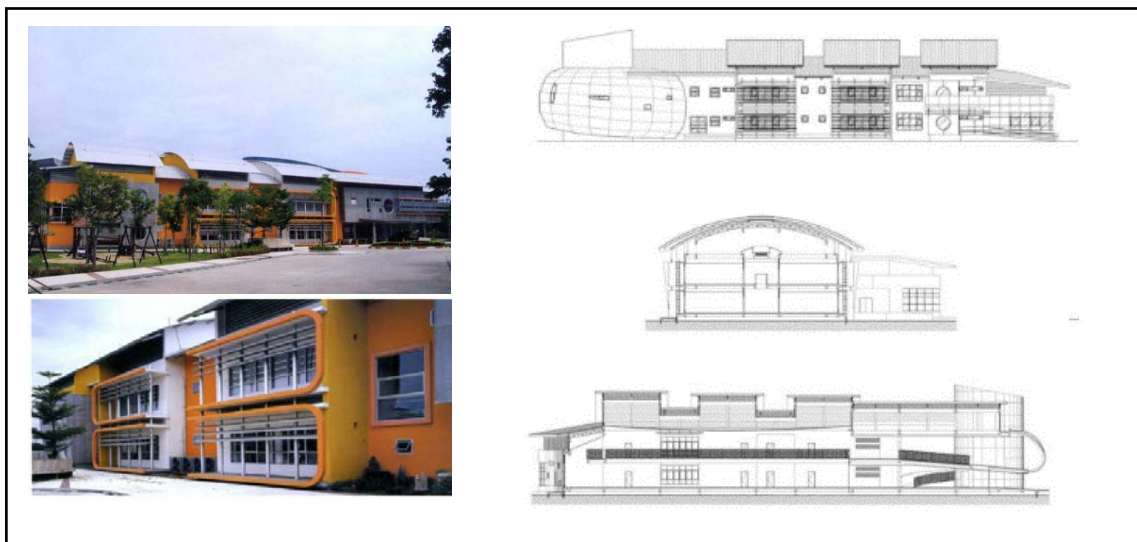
Examples of Building Facades for Children's Facilities in Pathumthani, Thailand (Dudek et al., 2007).
